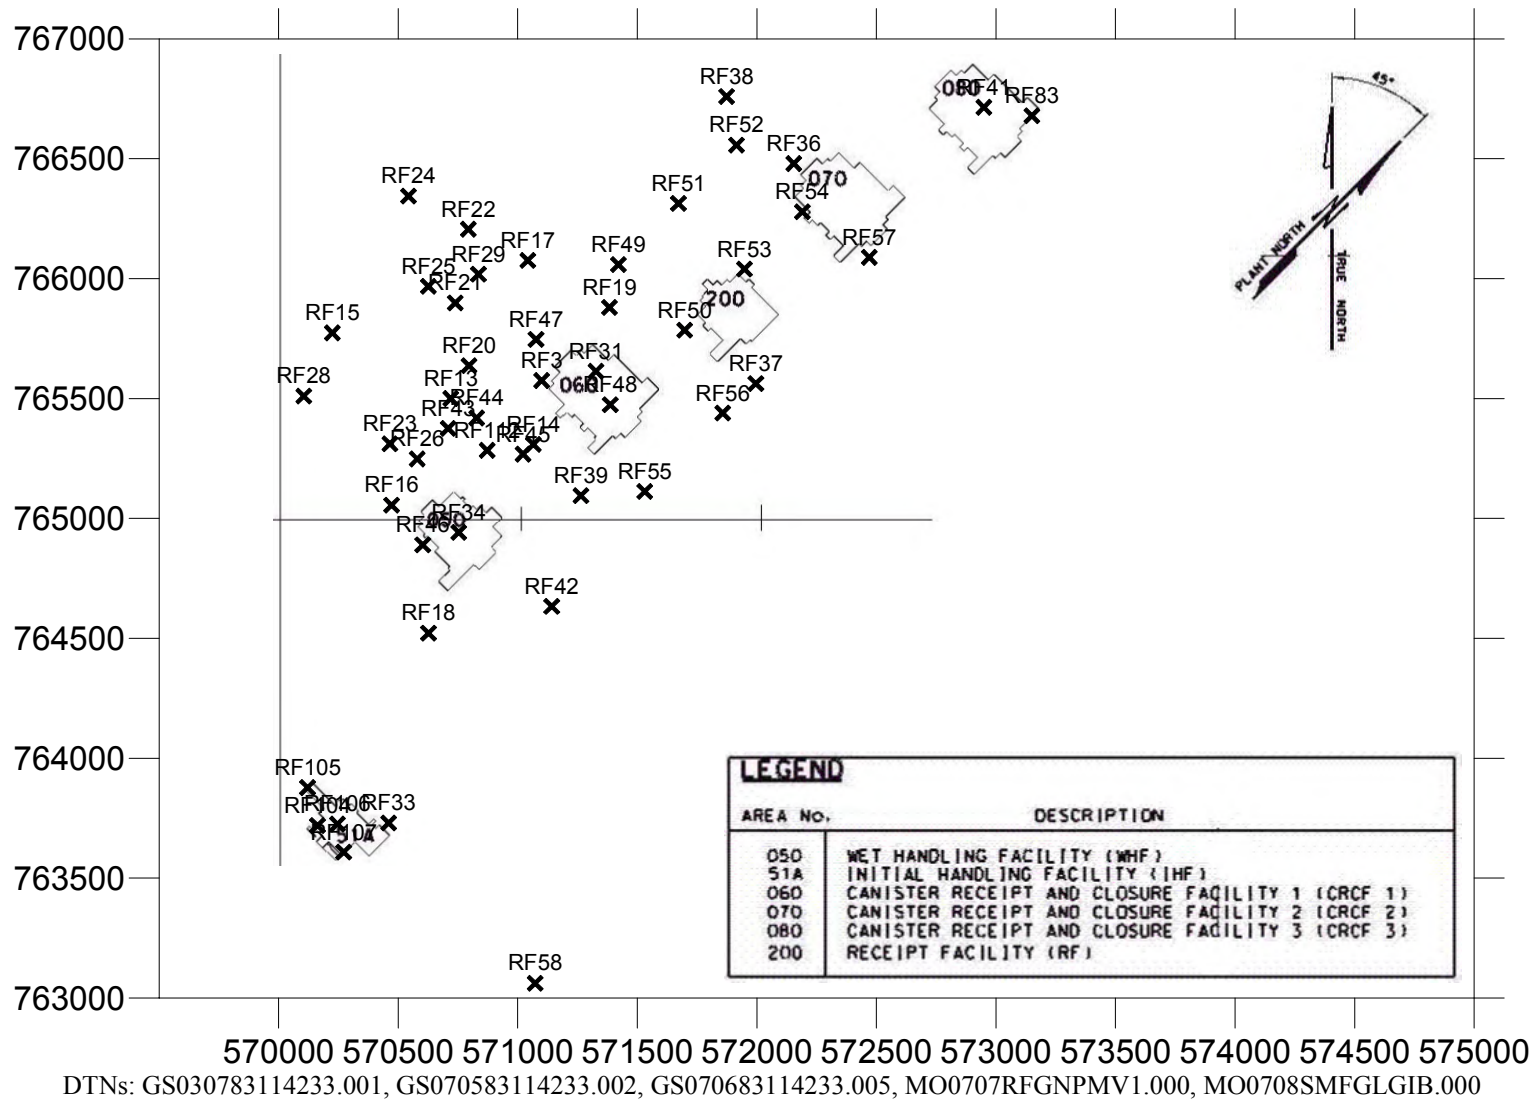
Locations of Borings in Surface Facilities Area with respect to Building Footprints.
